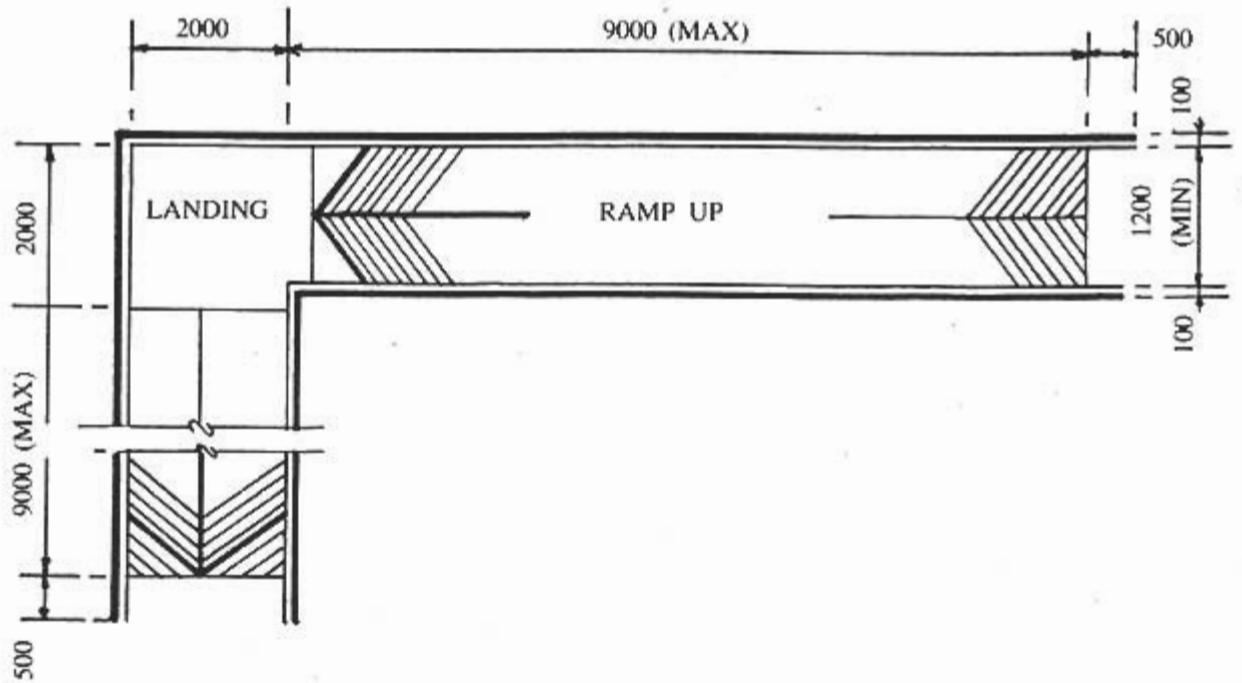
PLAN OF RAMP WITH ANGLED LANDING
